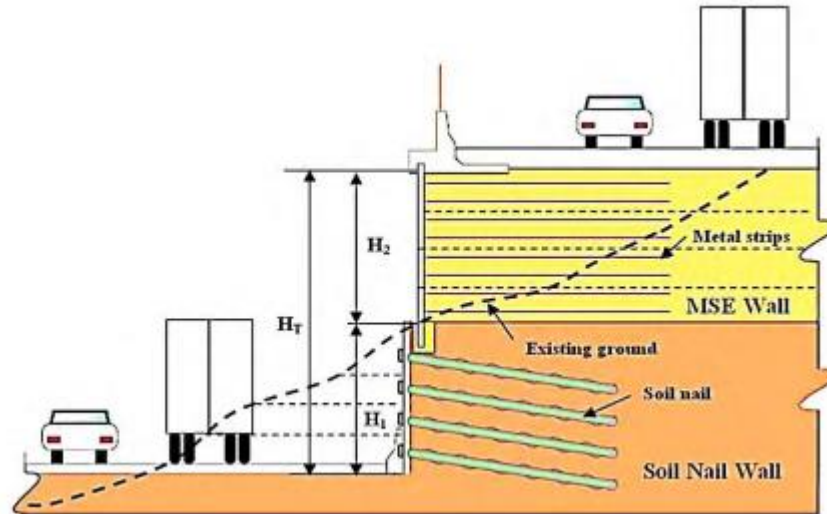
Illustration. Hybrid soil nail/MSE wall [9]
